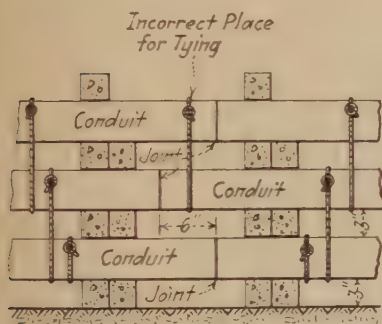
Side view of conduits showing the method of placing the separators and tying conduit in the built up method.
